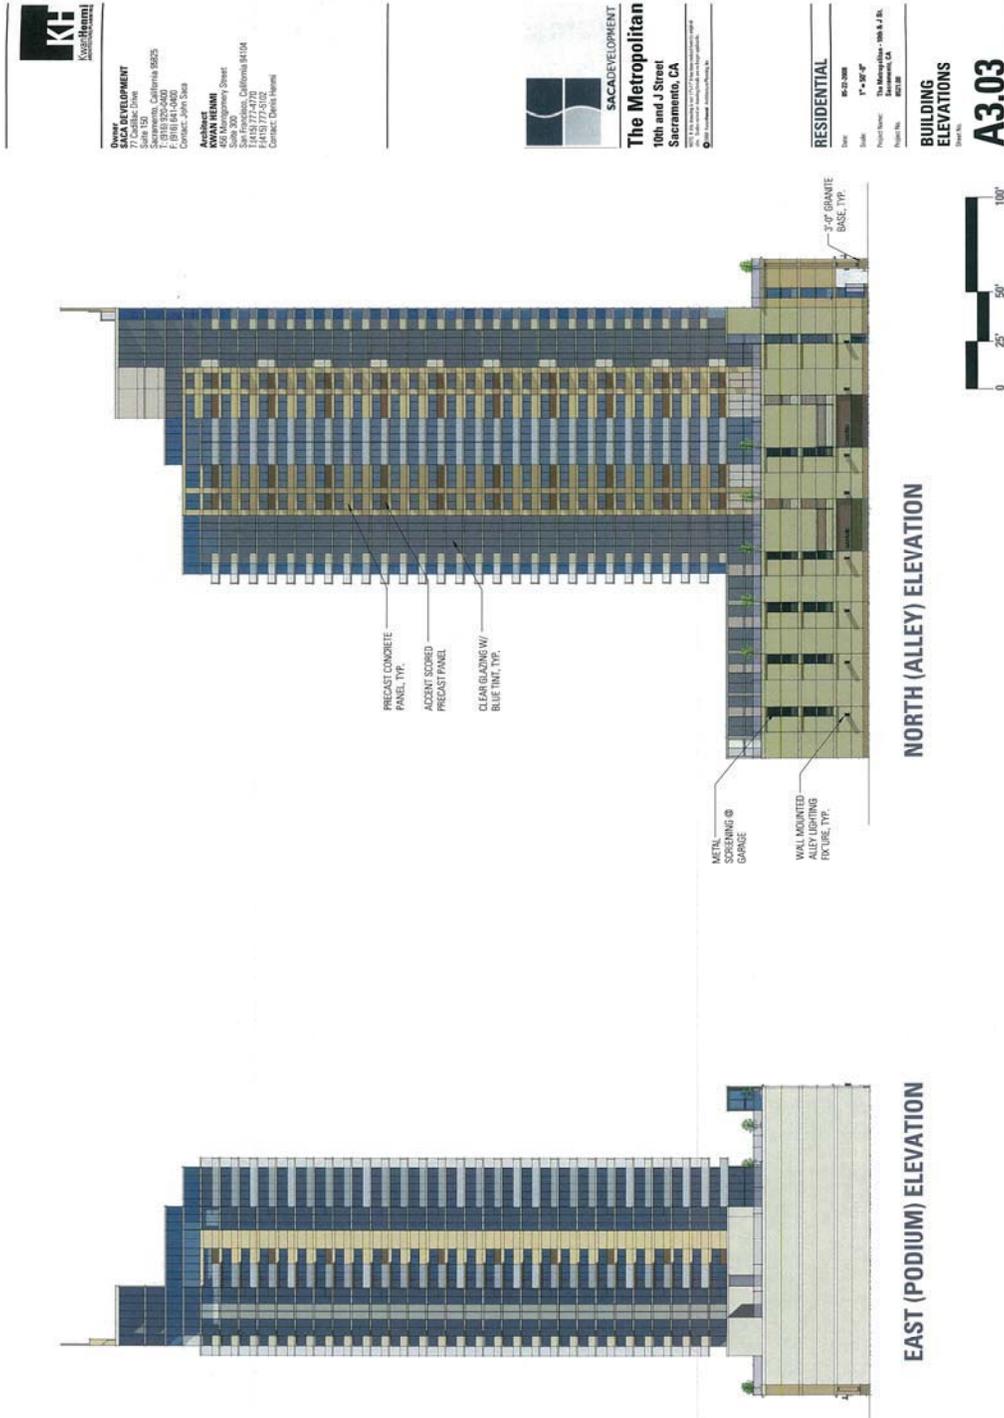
Exhibit Q – Building Perspectives (10th & J) (320 residential units)
